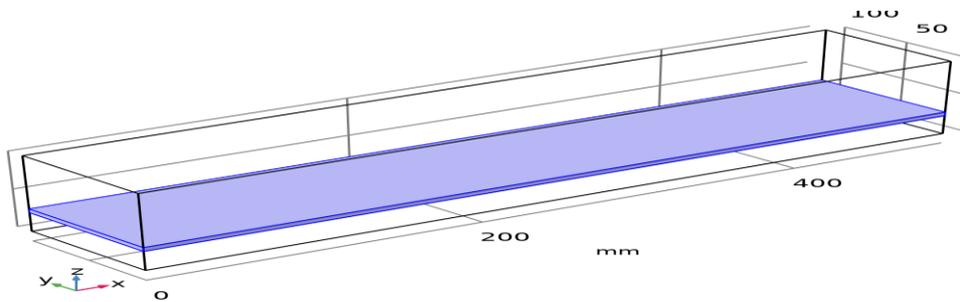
Reinforcement model of rubberized concrete containing 5% of replaced rubber
